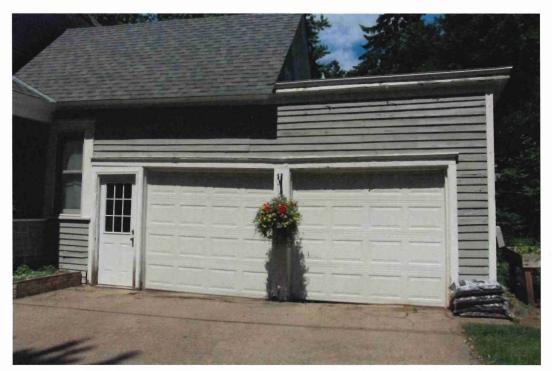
Garage addition at rear (southeast) elevation, view facing northeast.
